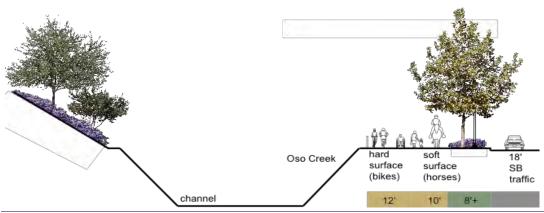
Typical Cross Section of Oso Creek and Forbes Road North
